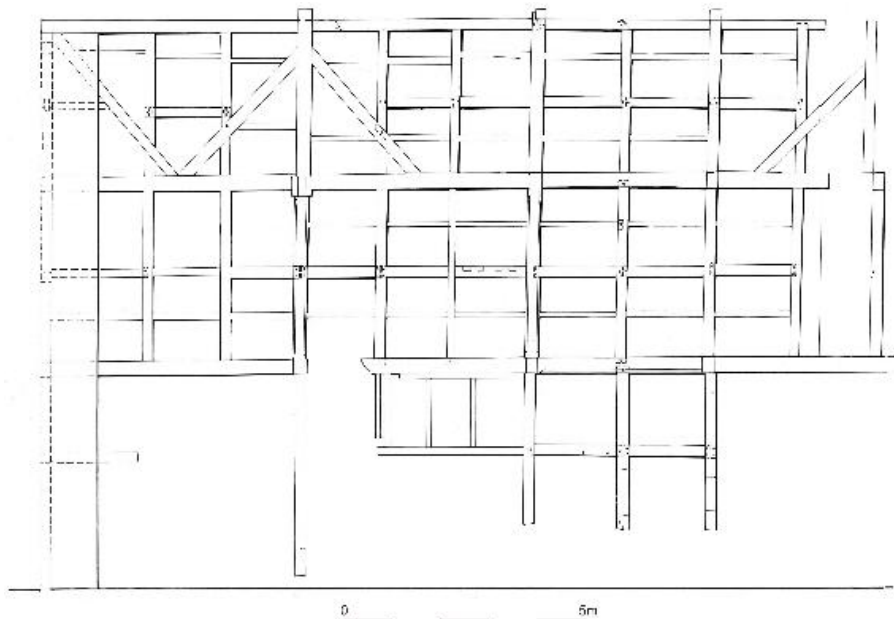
The internal face of the western side-frame of the rear building of 10-11 High Town; the braces are secondary but were added quite early on, before the frame infills were replaced with brick nogging. Original window and doorway openings have all been blocked in the past
